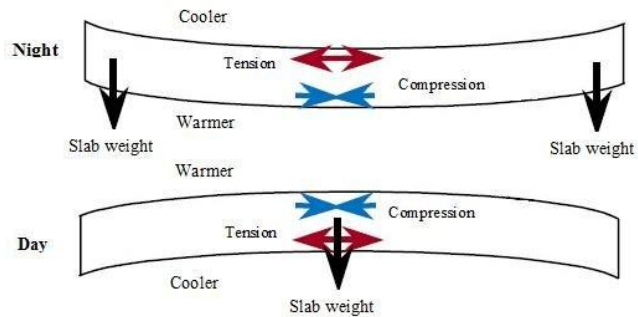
Curling of concrete slabs (Khayat and Sadati, 2014)
